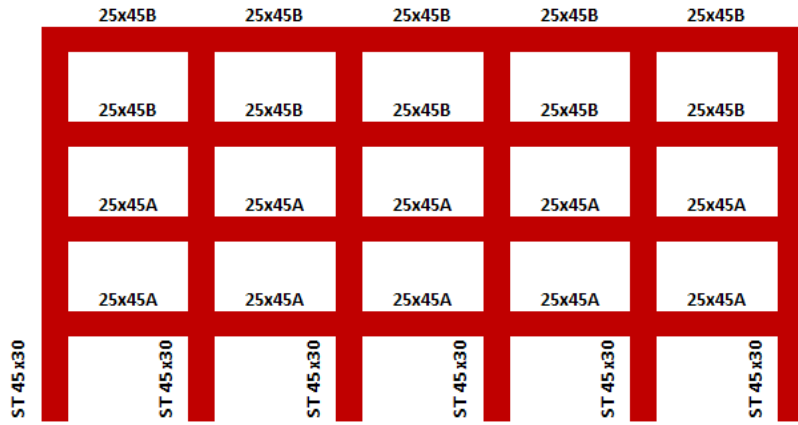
Dimensions of the frame elements, existing 4 storied structure
